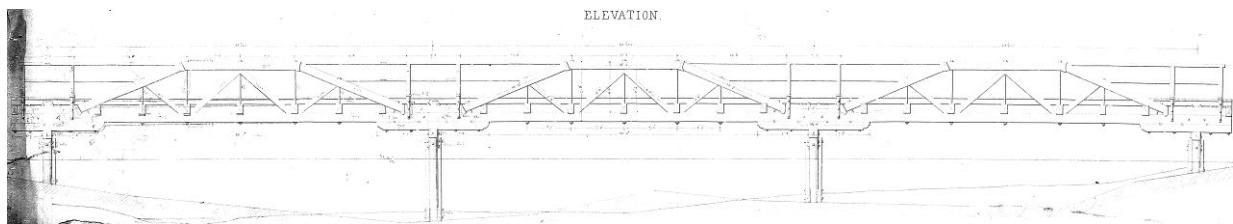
Bennett's Murrurundi Bridge, 1860 (50' Spans)
